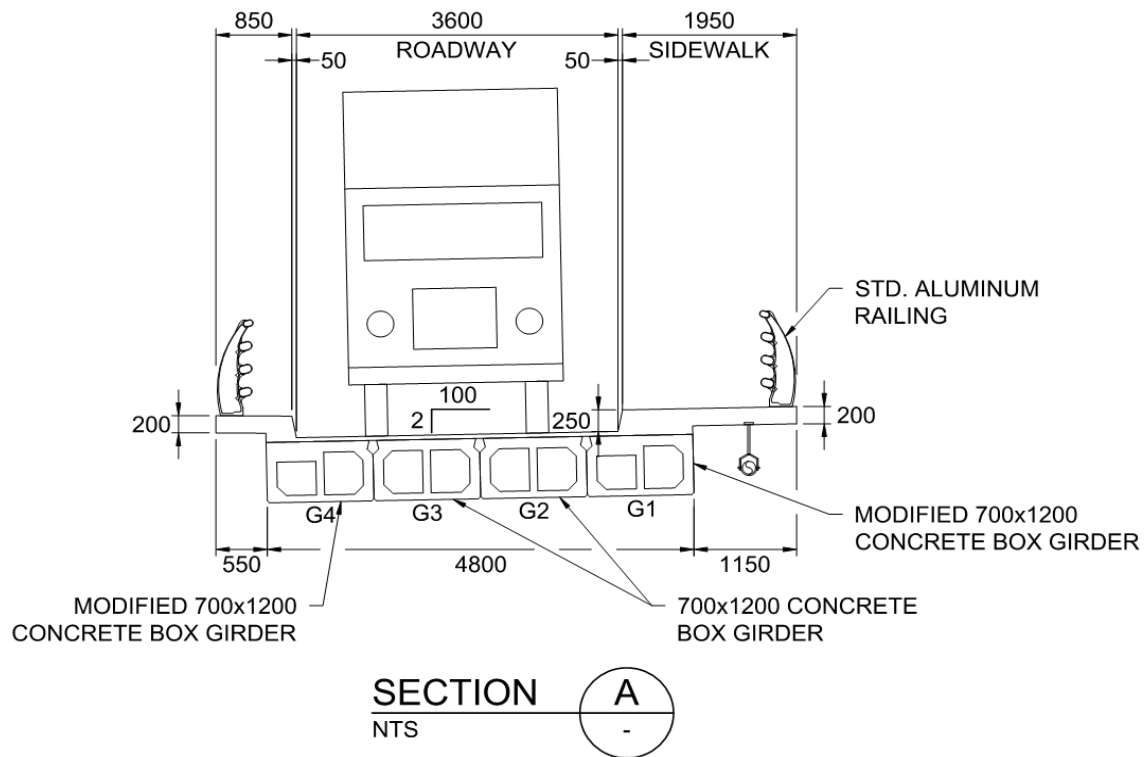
Isleview Place Bridge over Alberta Creek (Upper) – Section
